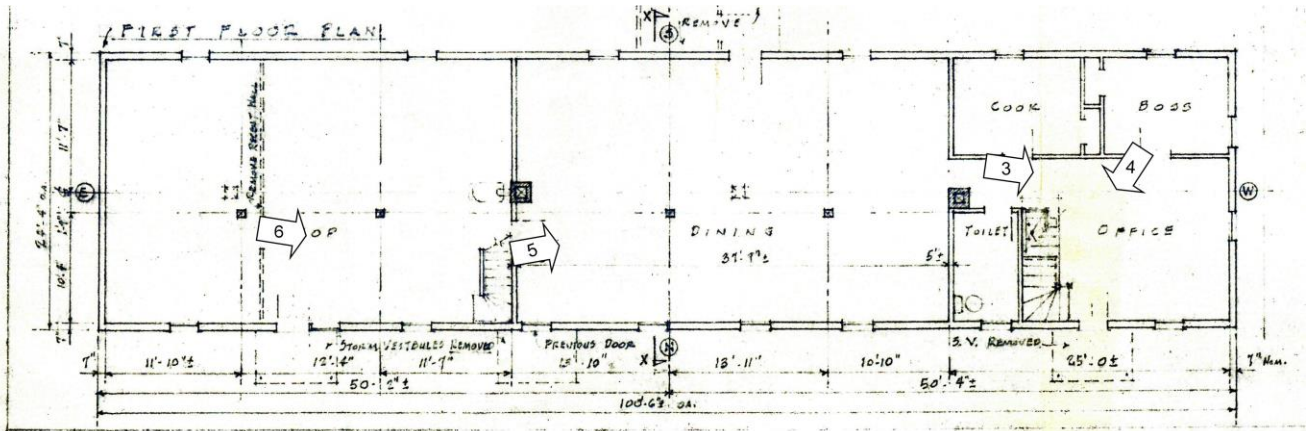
Boarding House first floor plan and photo key. (Image from Yarnelle drawings, Maine Bureau of Parks and Lands files.)
